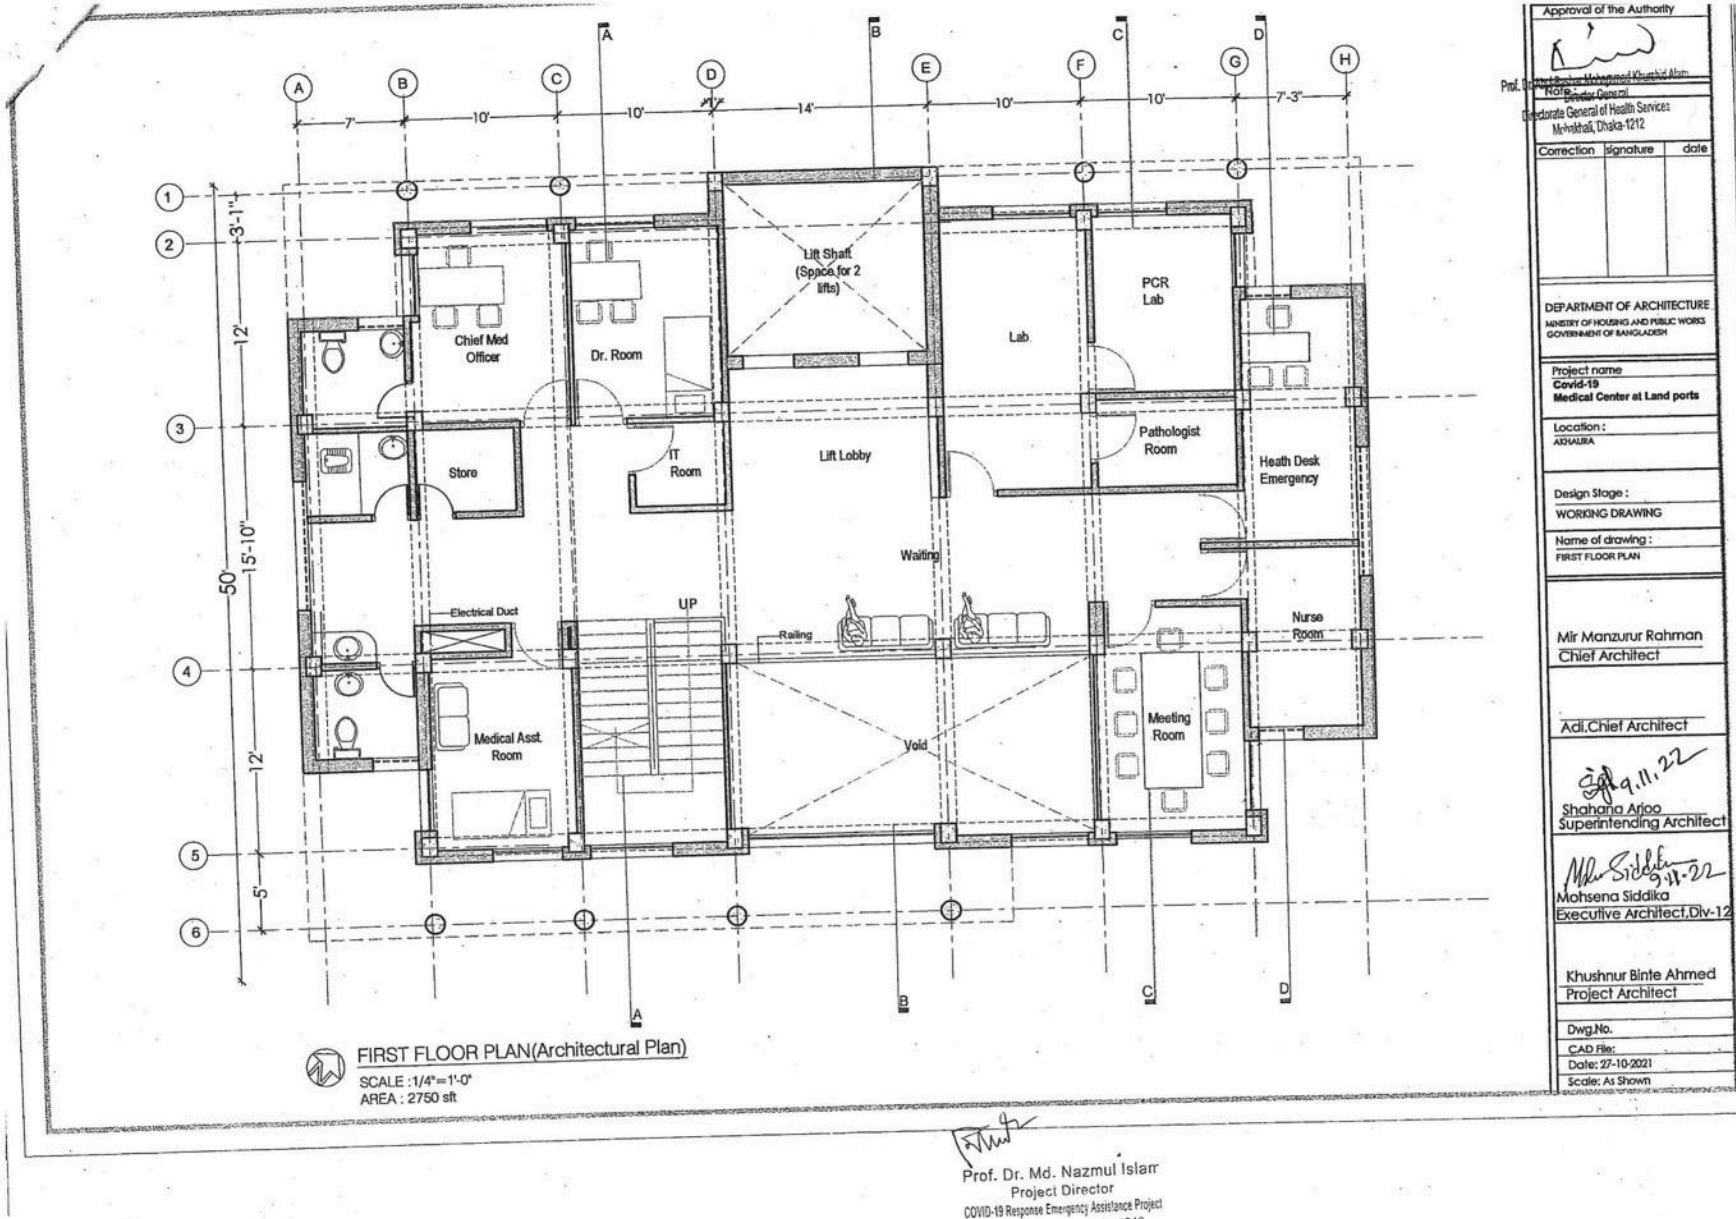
First Floor Plan of the Proposed Medical Facilities
